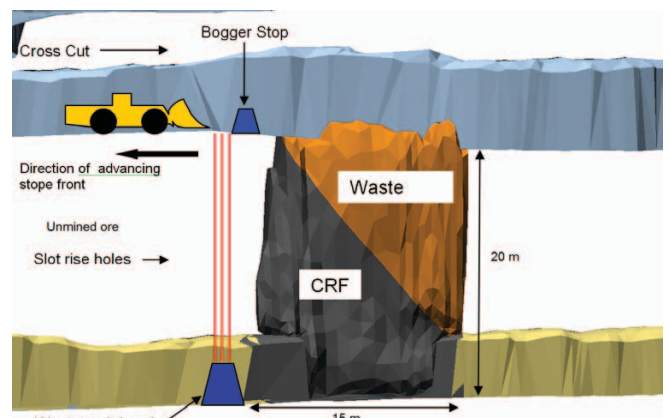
Schematic diagram of cemented and uncemented rock filled stope (after Van Der Merwe, 2009).
